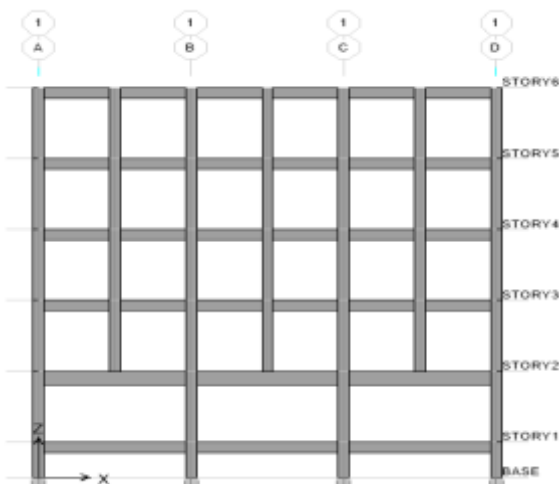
h: Elevation of G+6 story building with floating columns
